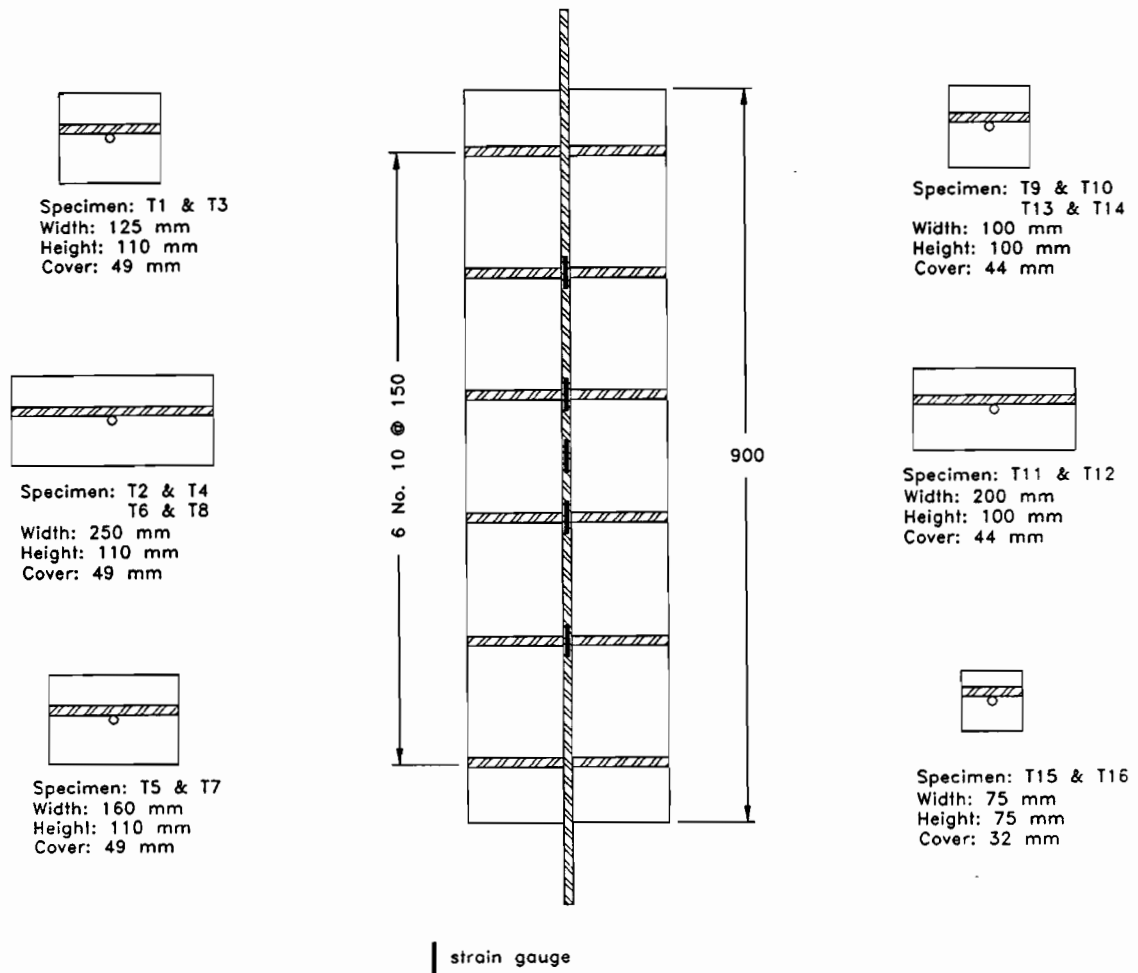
Cross-sectional dimensions and reinforcement details of tension specimens
